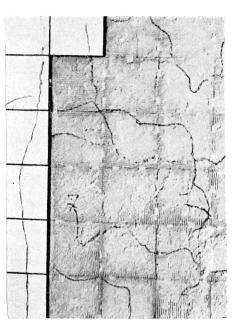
Drying cracks in the mortar have caused cracks in the wall tiles.
